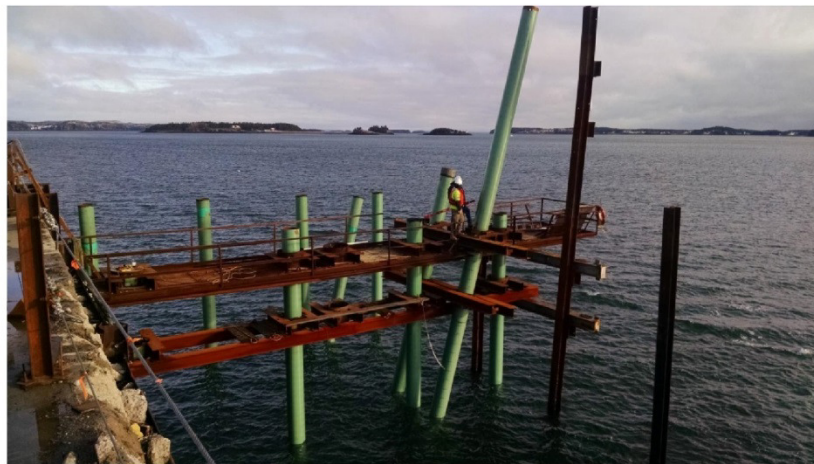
Bent 2 Template Showing Pile Arrangement and Battered Spin-Fin Piles
